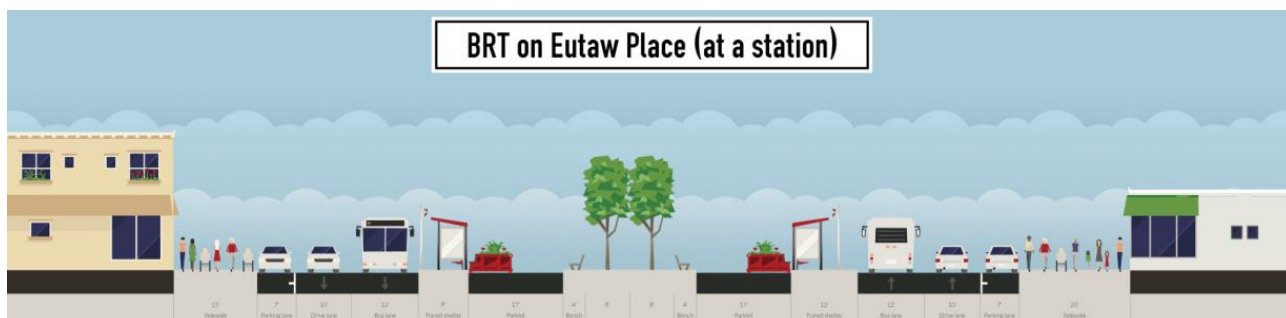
Possible BRT cross section for Eutaw Place. Alternative would be to convert the parking lane to a traffic lane.
